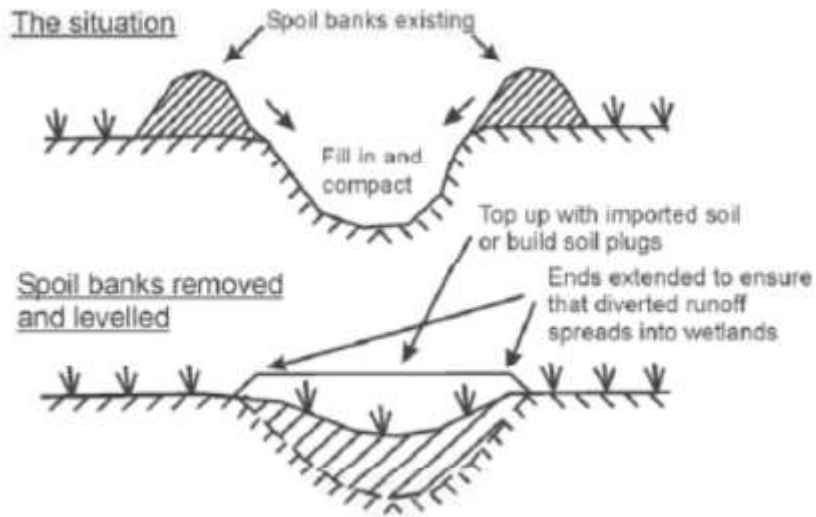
Example to backfill a drain / gully (Russell, 2009)
